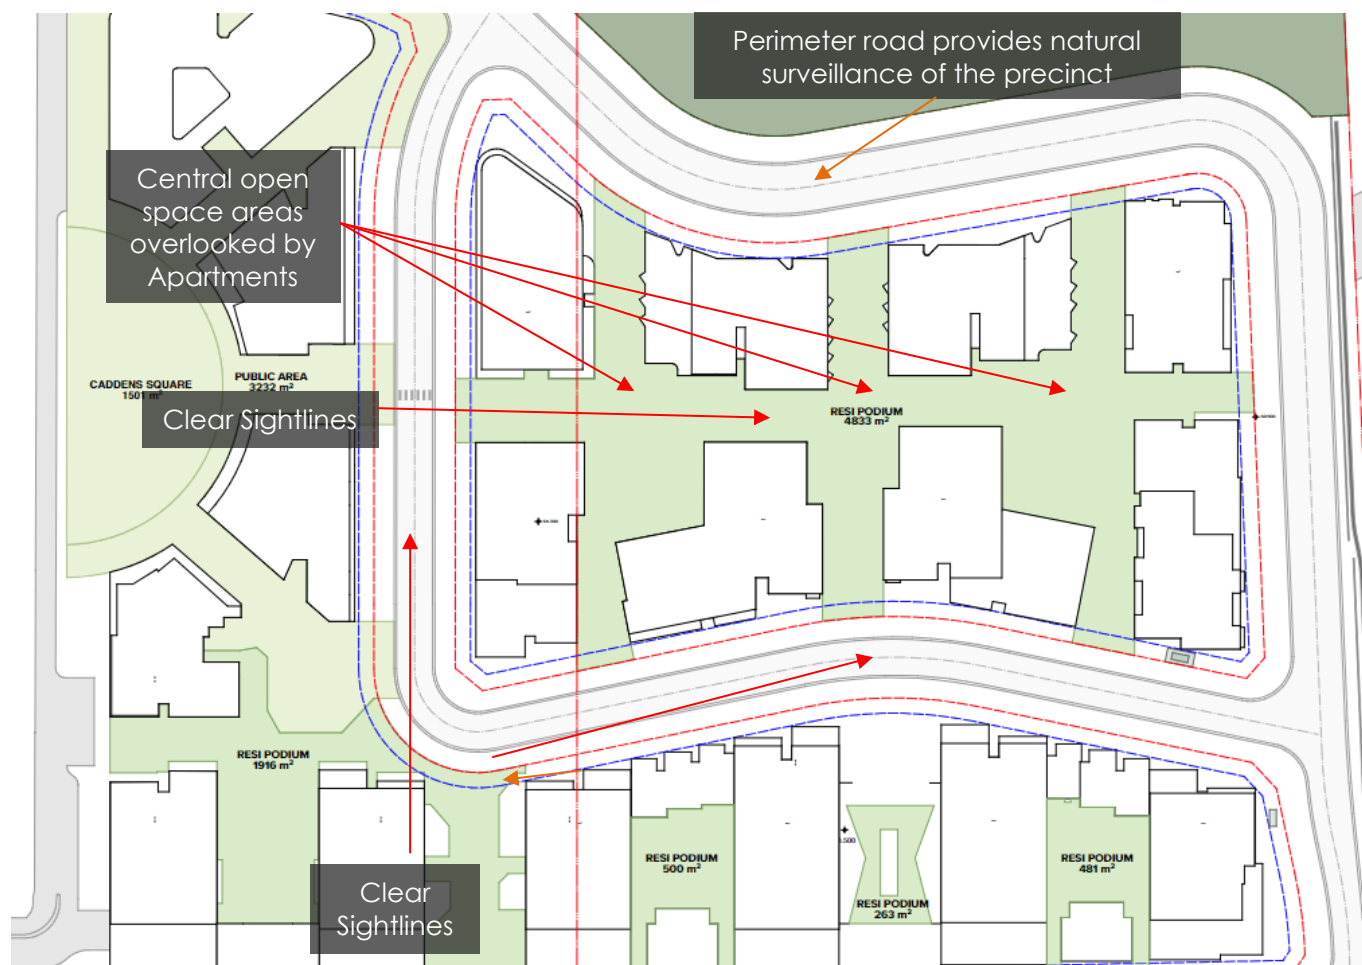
Extract Local and District Open Space Plans (Source: Turner, 2024)
